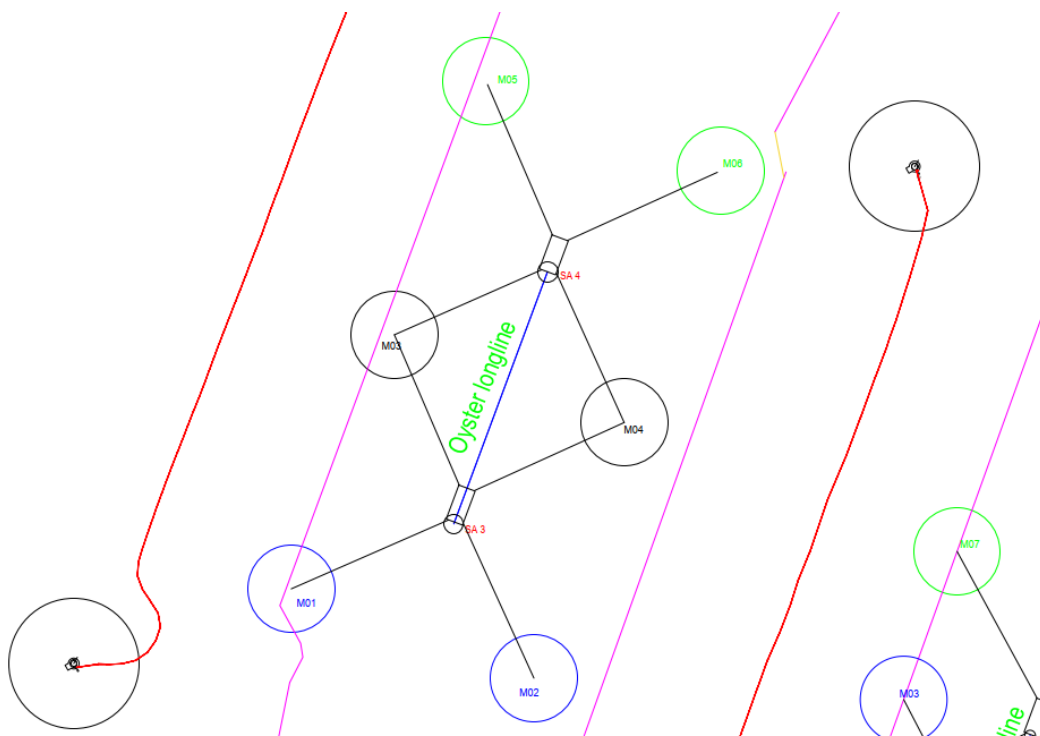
Drilling of four screw anchors of the Belgian pilot with a drill rig and by staying in position with a 4-point mooring set-up.
